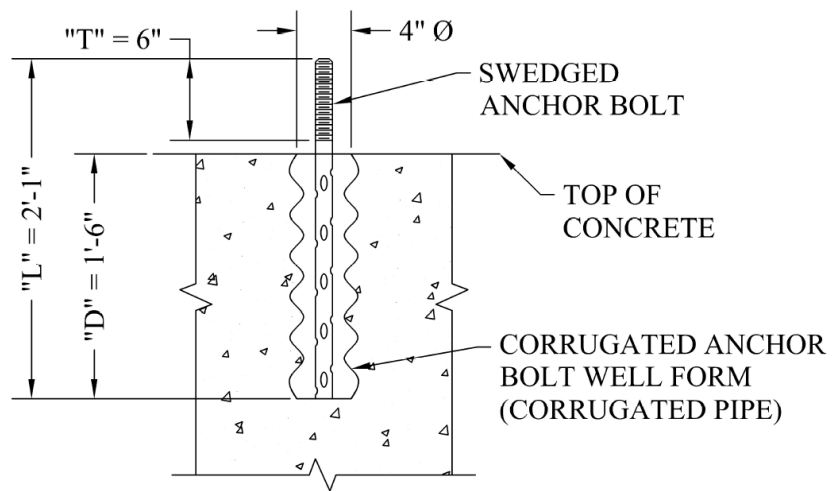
Anchor bolt and well detail for fixed bearing (Bent 9)
